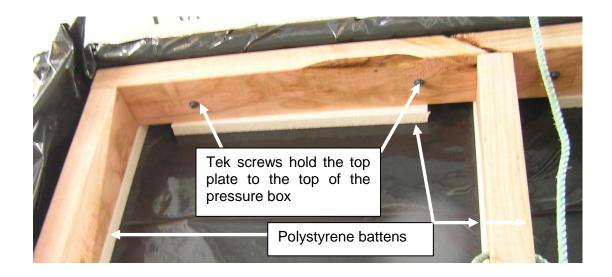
Tek screws used to fix the test wall at the top and polystyrene battens.
